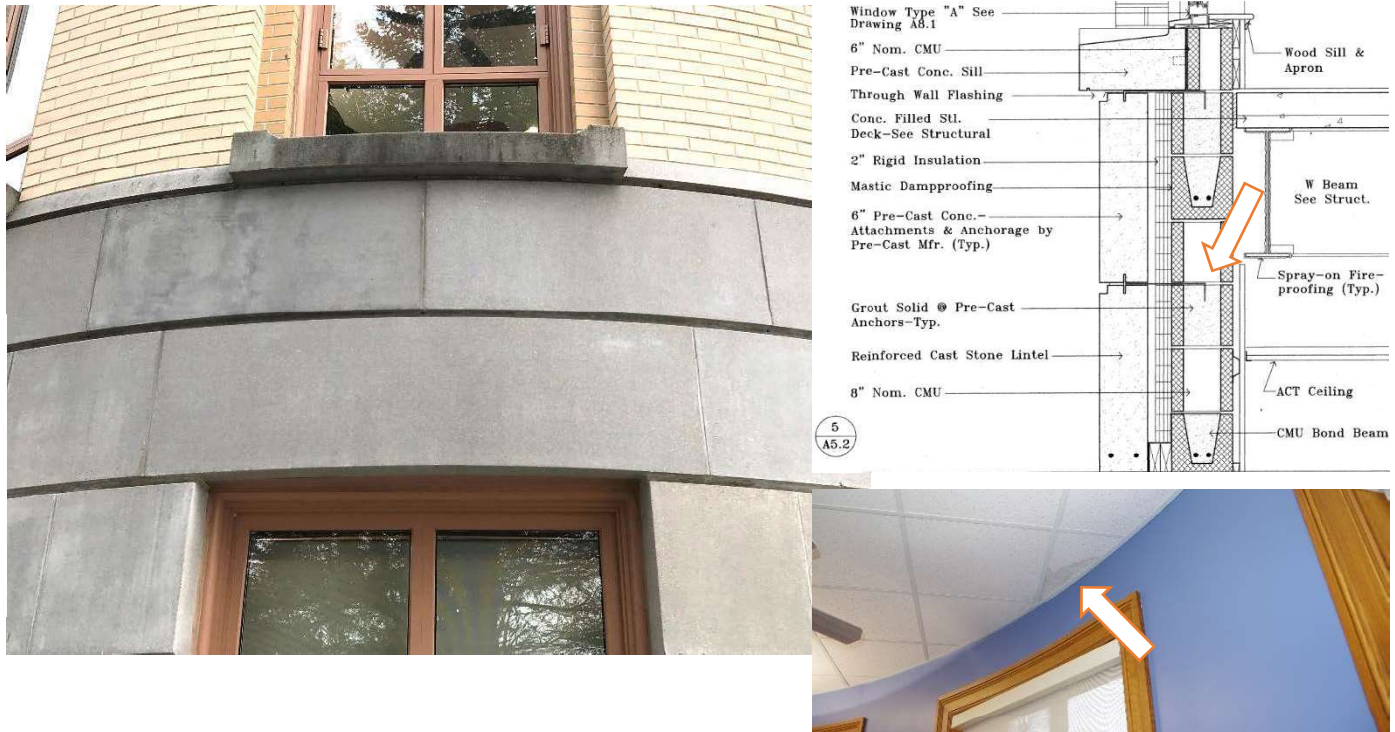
Flashing configurations and precast veneer anchors are suspected sources of moisture infiltration above the first floor windows on the West Elevation. Presence of embedded throughwall flashings could not be confirmed at the lower level precast veneer wall areas. Additionally, precast veneer anchors appear to penetrate the mastic dampproofing applied to the exterior walls (upper right detail), which may be a source of moisture infiltration above the finished ceiling (lower right photo).
